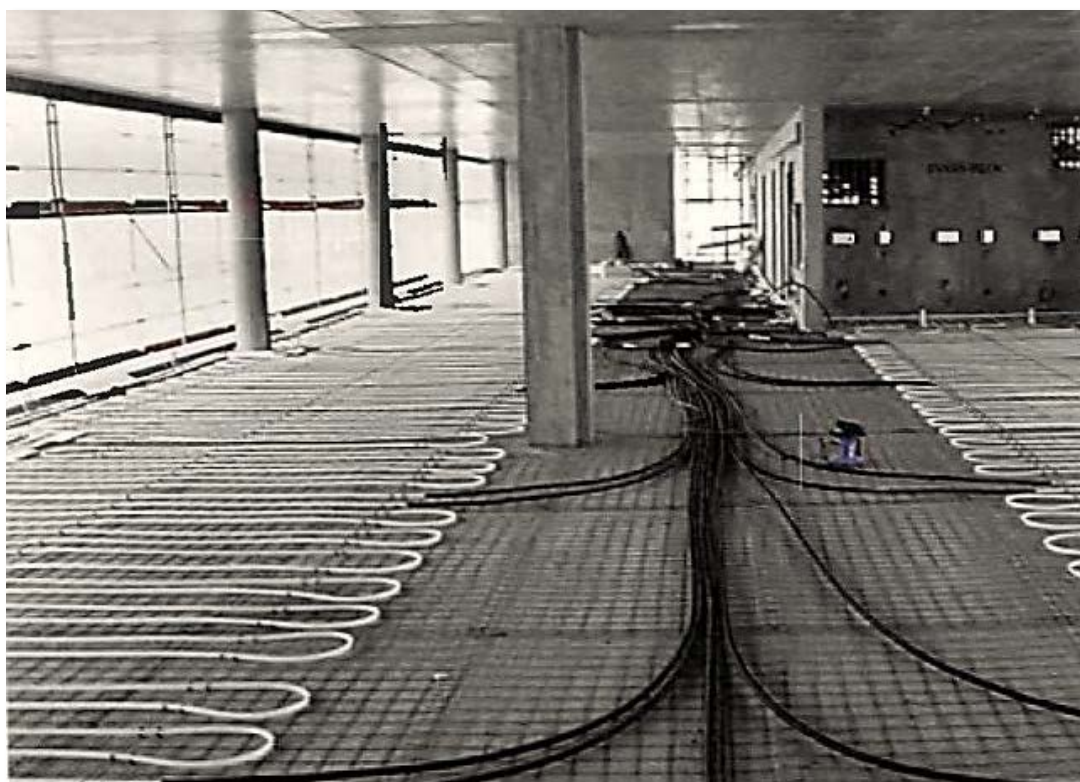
Office complex, Wiesbaden, Floor slabs heating & cooling
